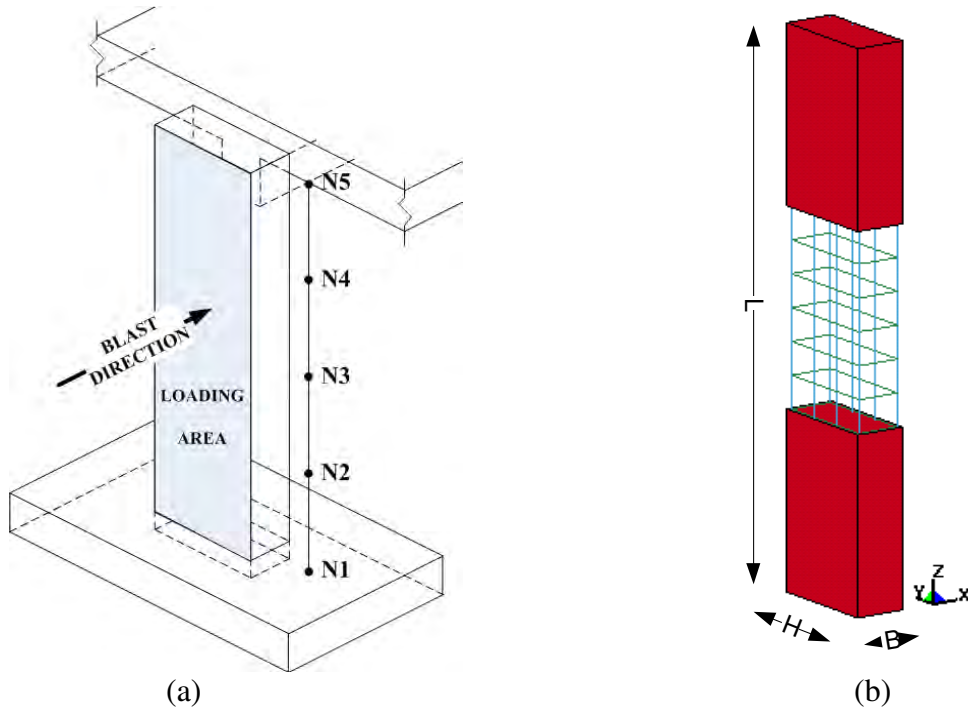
Column cut-out (a) First floor exterior column (b) Typical reinforcement details
